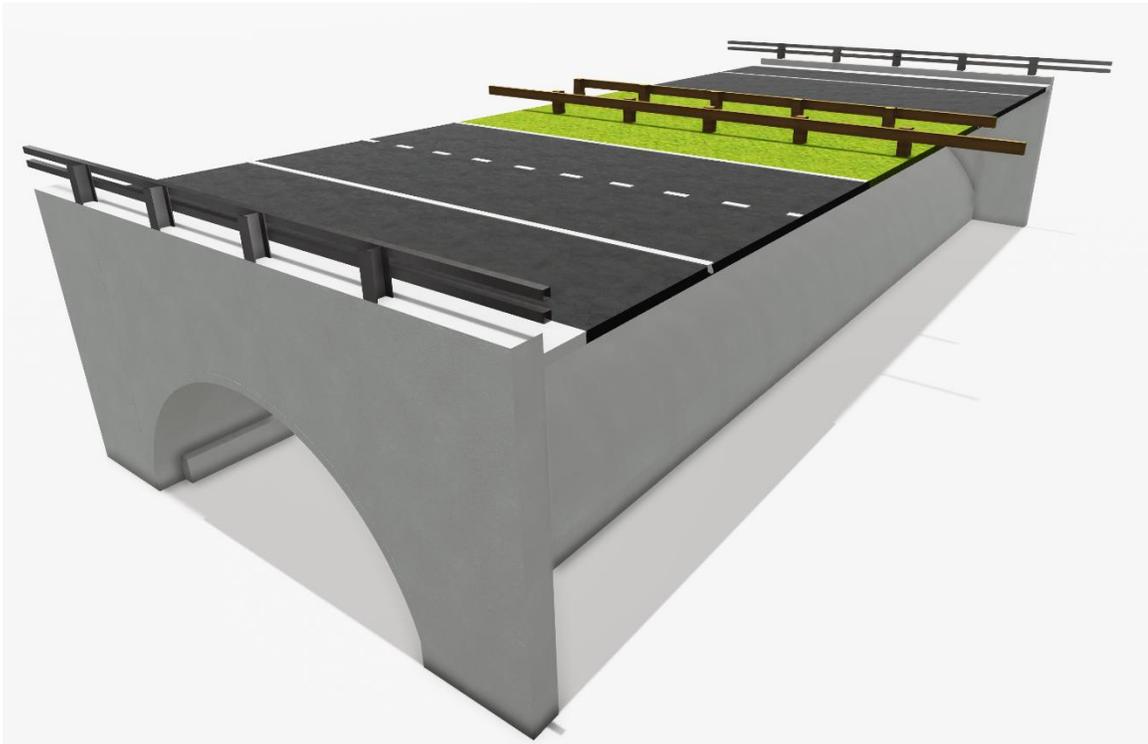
Jamestown Arch IV, 3D-Model Overview, View to North-West (own figure)
